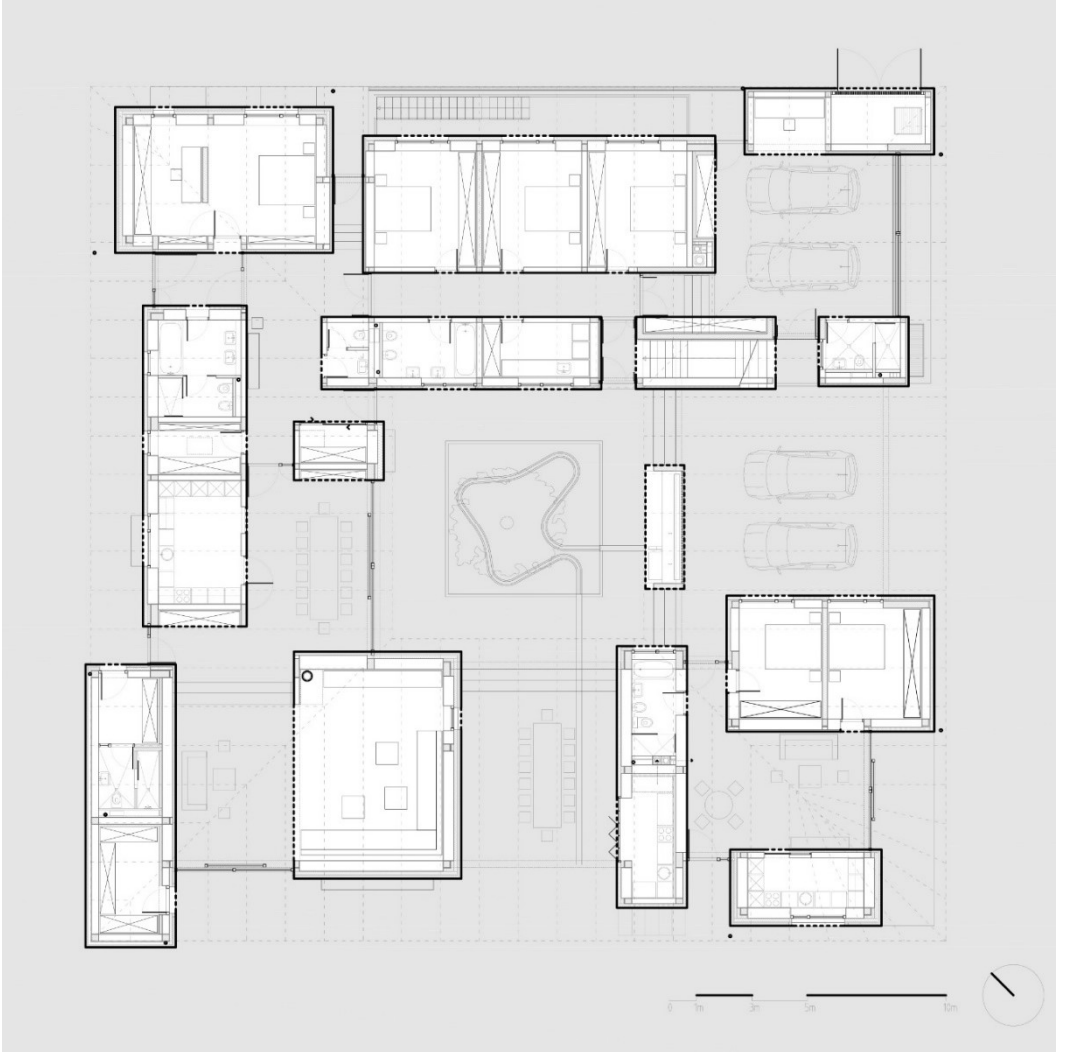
House VLHS, ground floor plan - © Vedad Islambegović
